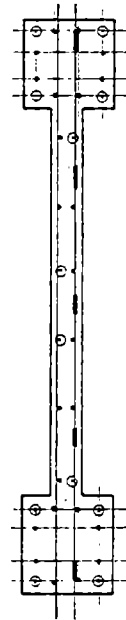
Strain Gage Locations in Elevation of Test Specimens
